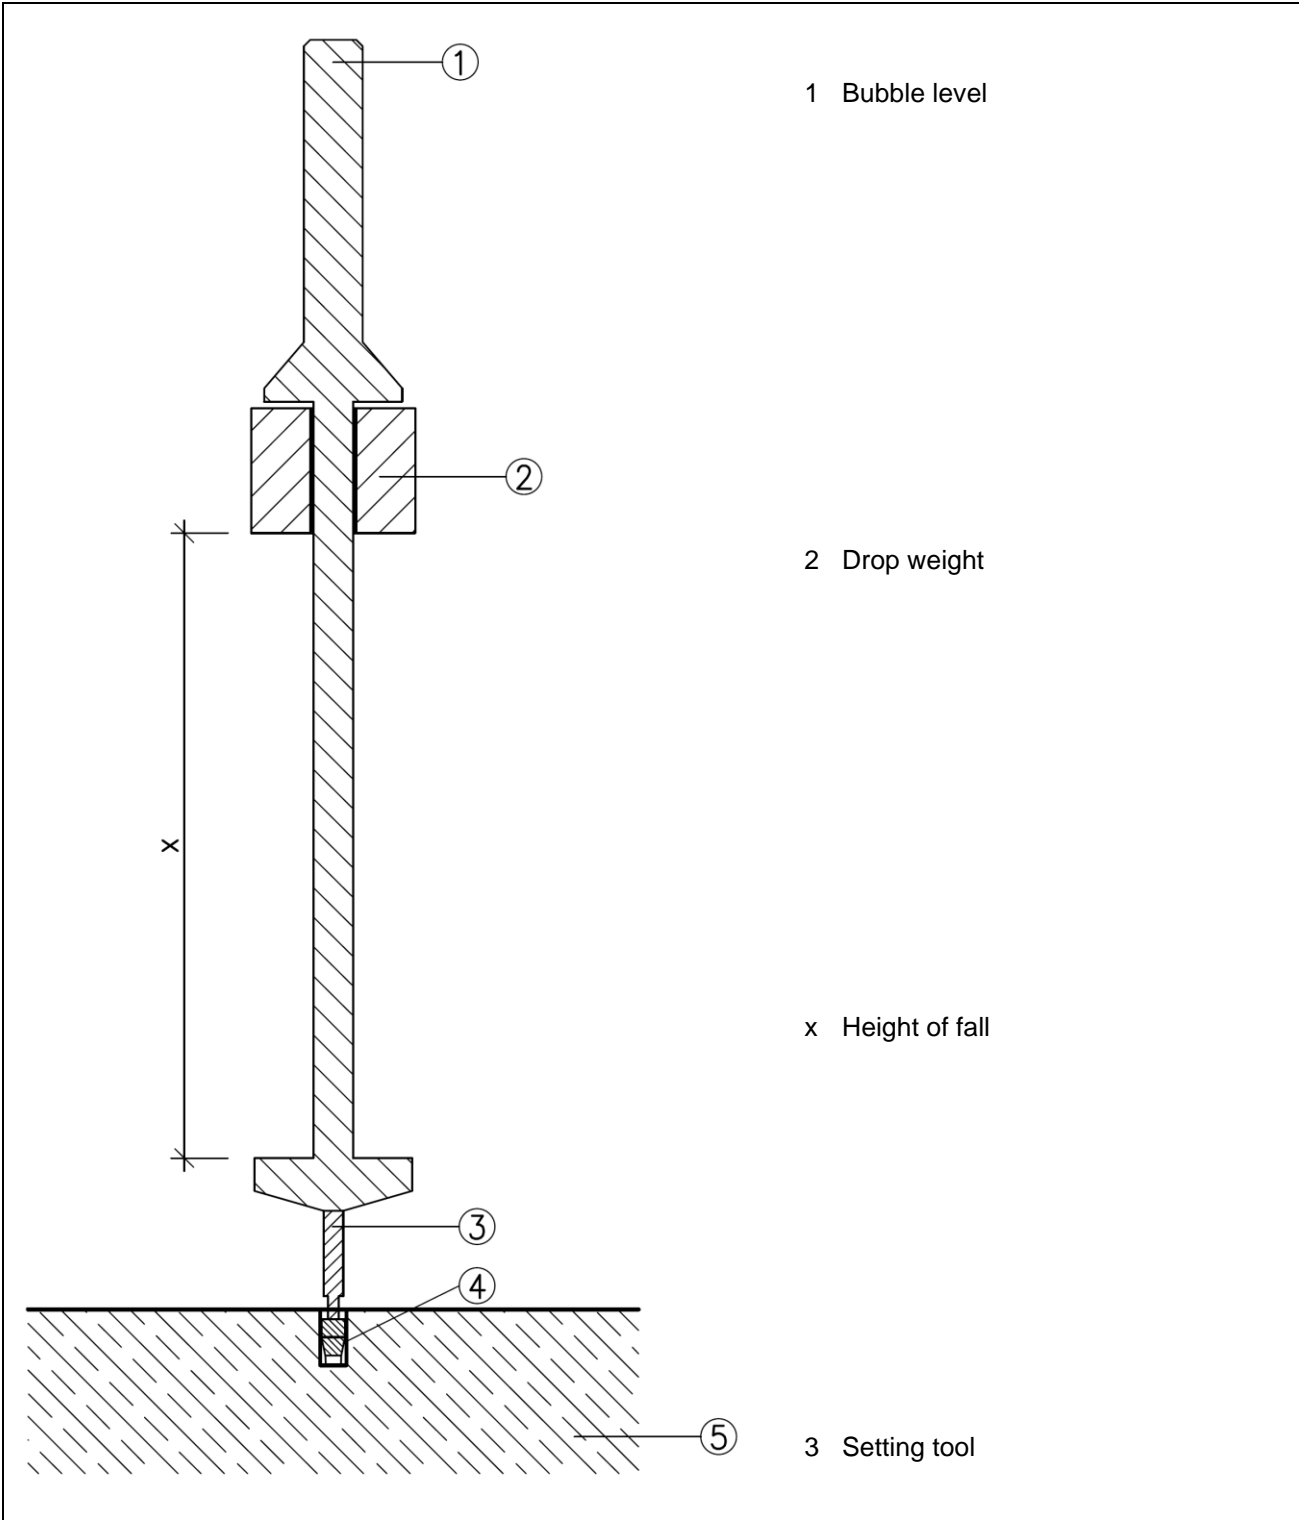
Arrangement for tests to determine the degree of expansion (schematic) – example of setting a drop-in fastener
